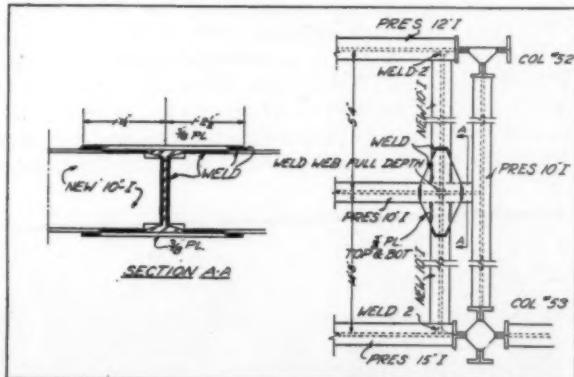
Arc Welded Connections Where New Beams Were Inserted to Relieve Old Beams of Additional Load
